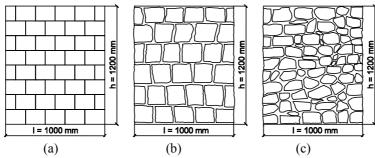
Geometry and bond details of the walls; (a) sawn stone units walls, WS; (b) irregular walls, WI; (c) rubble walls, WR.
